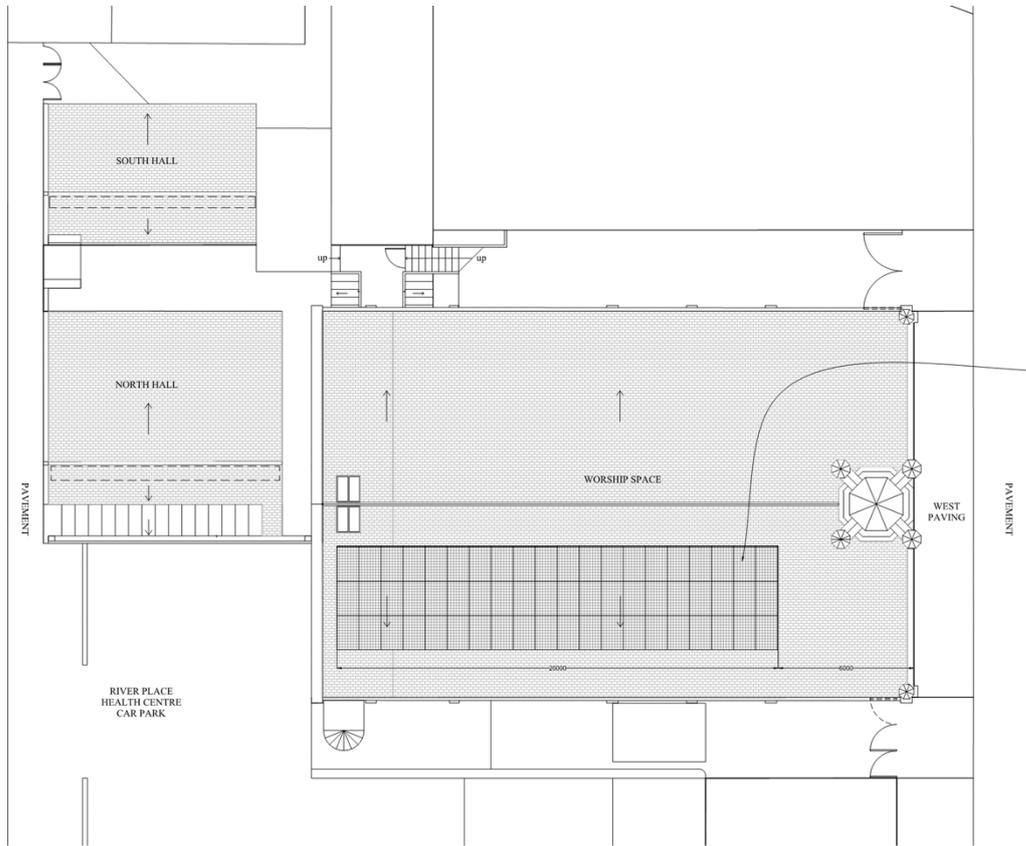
Proposed roof plan showing siting of PV panels on southern roofslope
